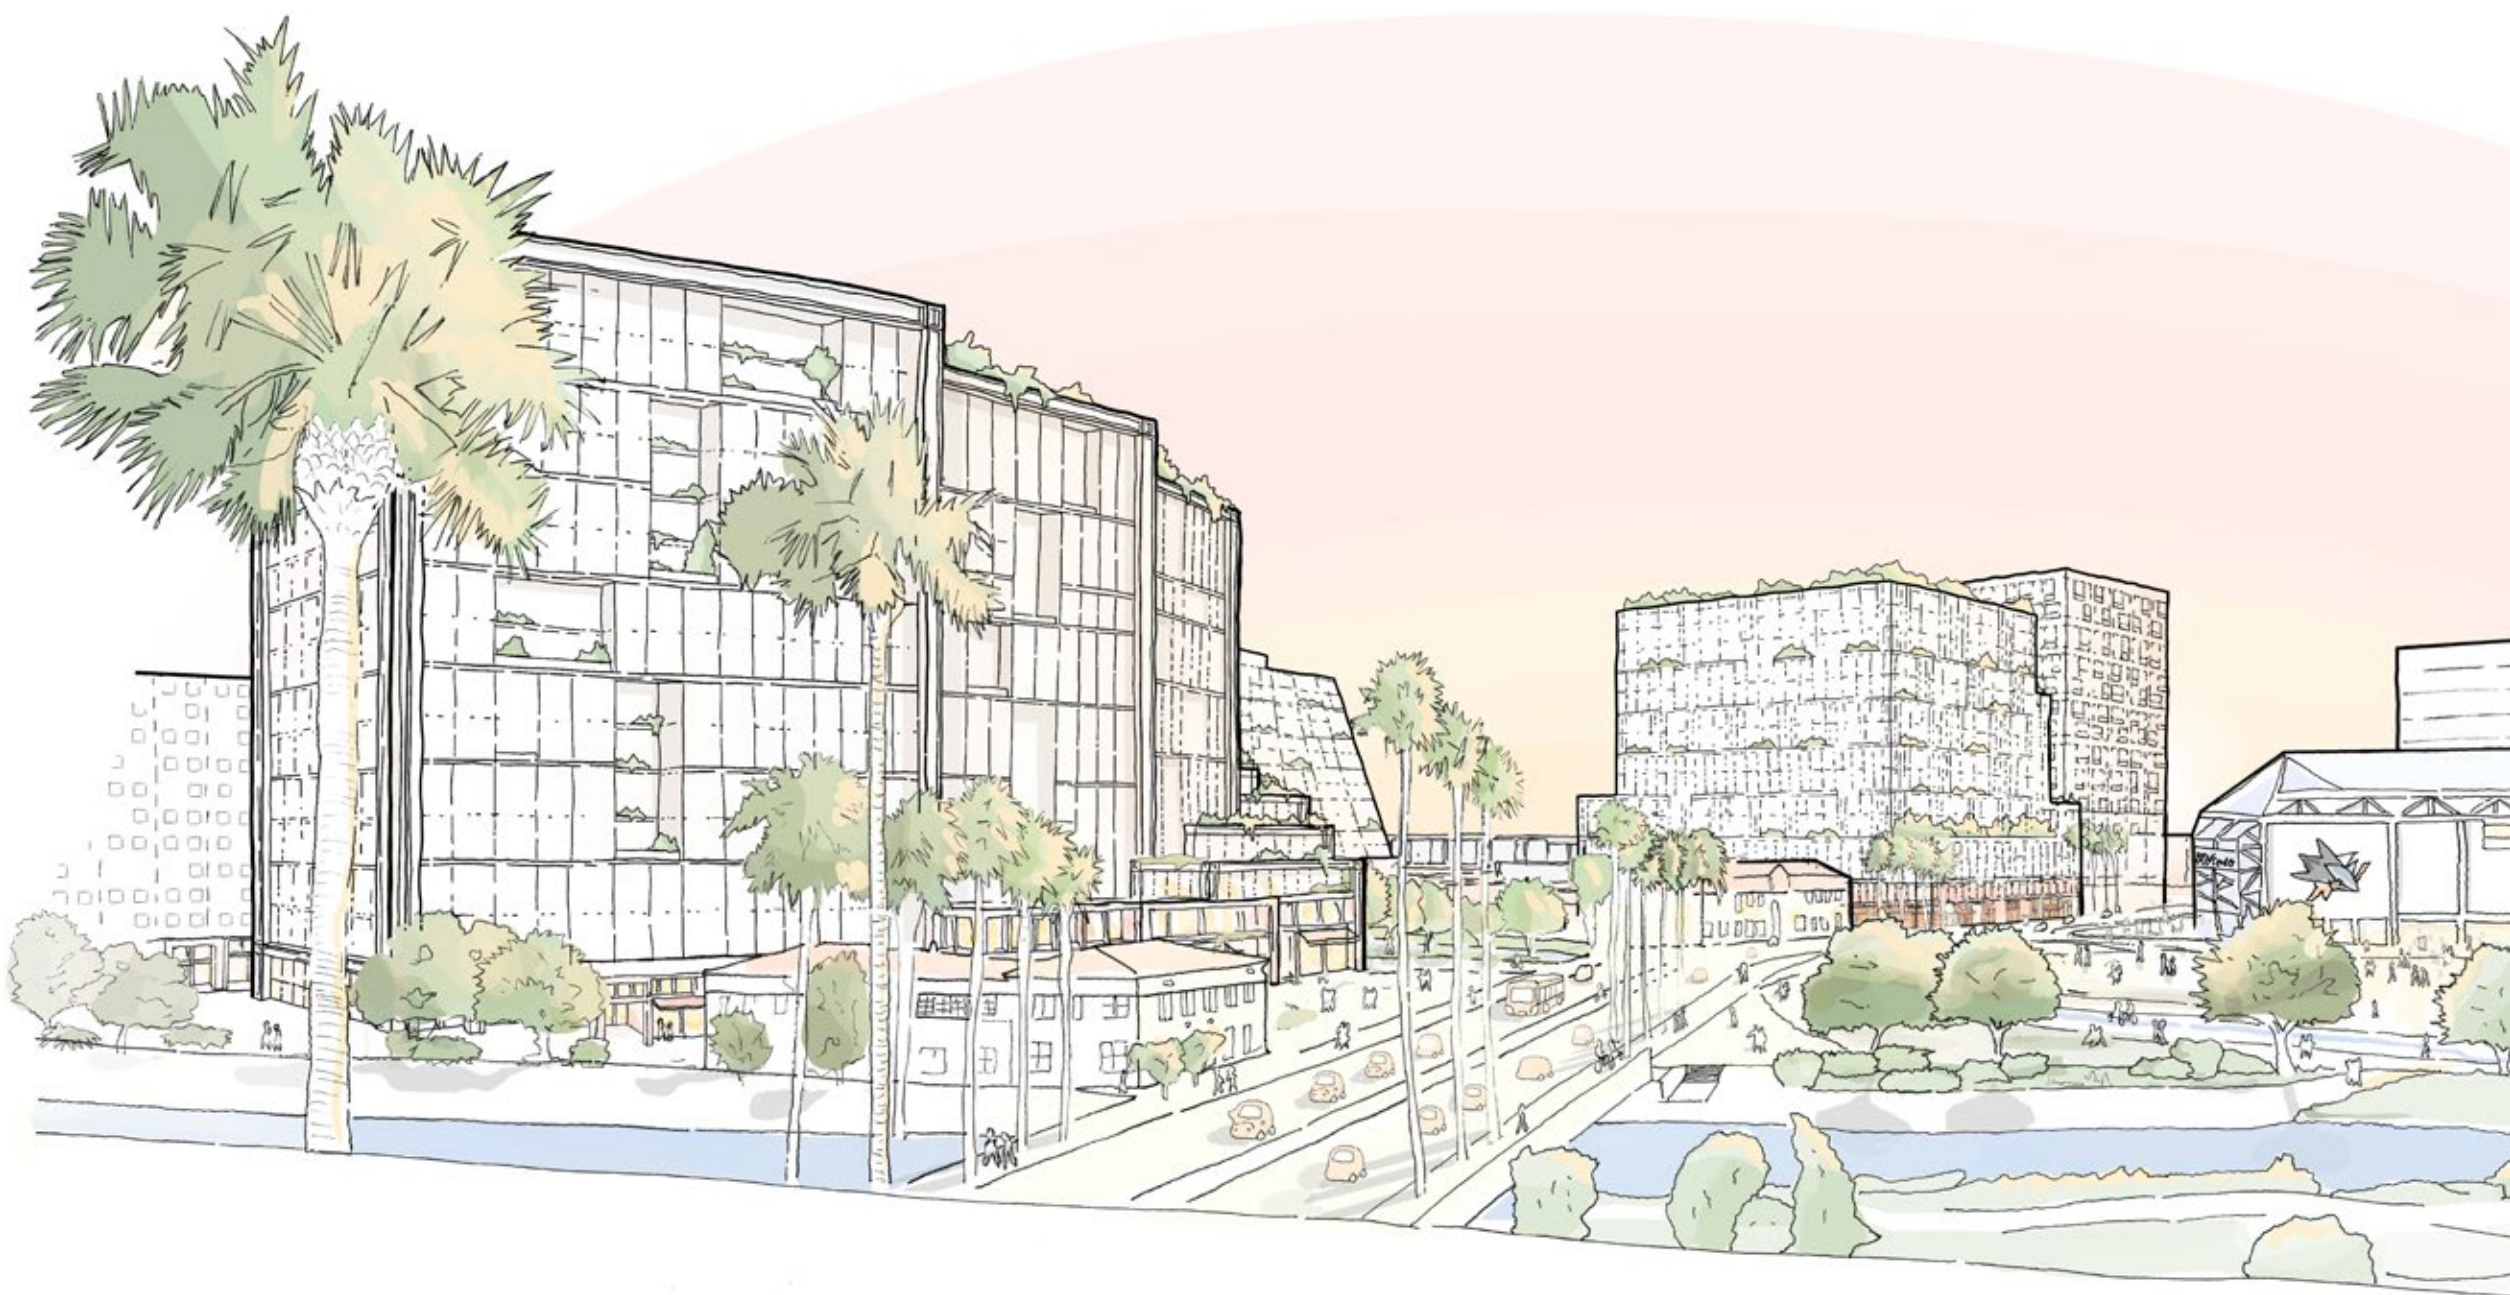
Conceptual Rendering of Proposed Project from State Route 87 Looking Southwest Illustrating Proposed Building Form and Massing
